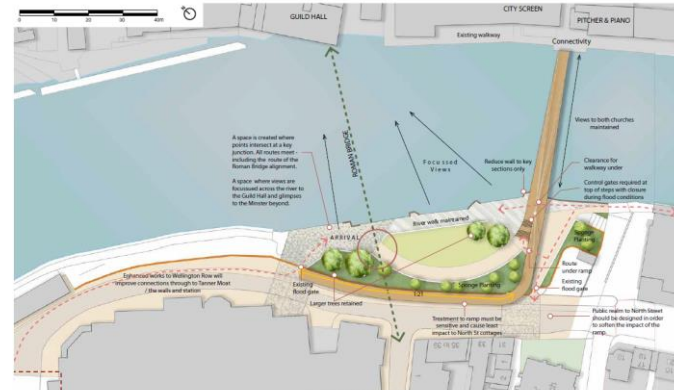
Proposed site and landscape plan for Alignment Option 2
